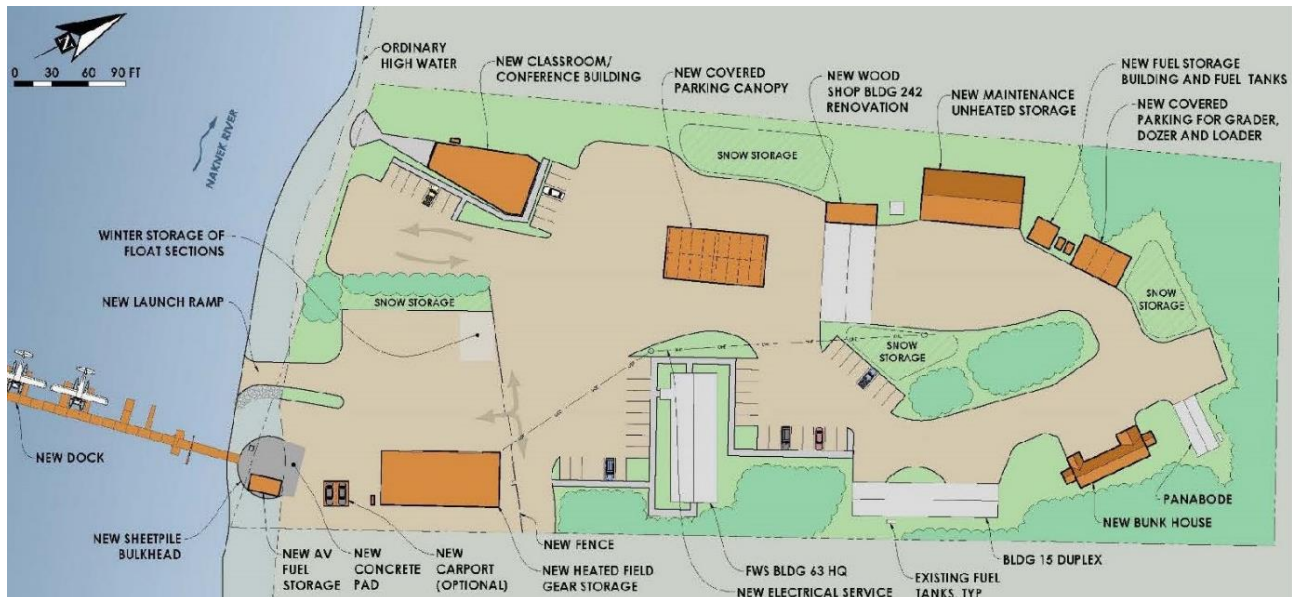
Proposed layout of the headquarters complex (PND Engineers, Inc, 2021).
